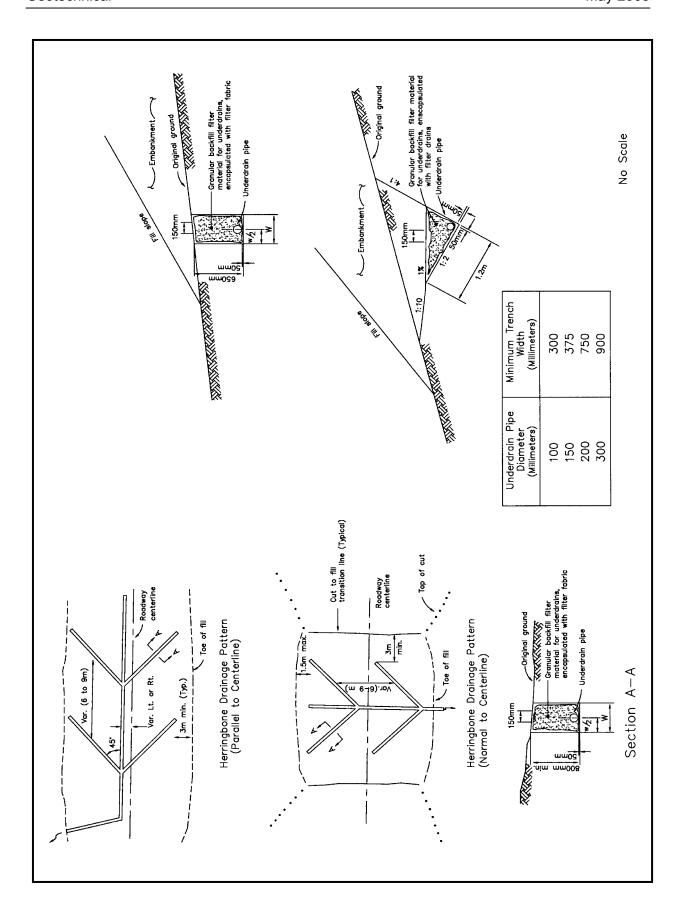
K TYPICAL UNDERDRAIN INSTALLATION IN EMBANKMENT AREAS (Metric)
